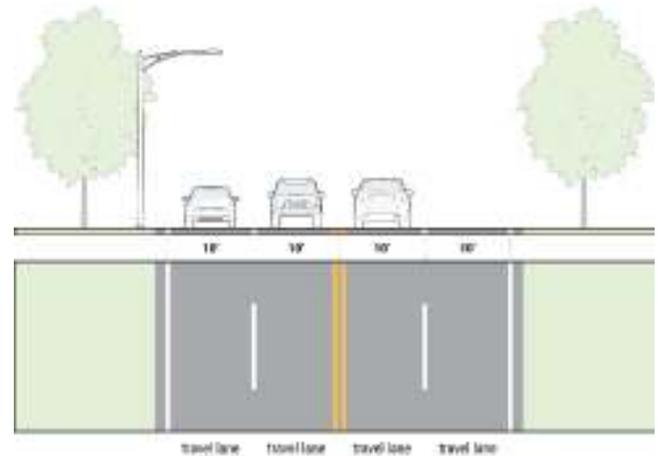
Hammond Pond Parkway Segment 3 Existing Typical Cross Section
